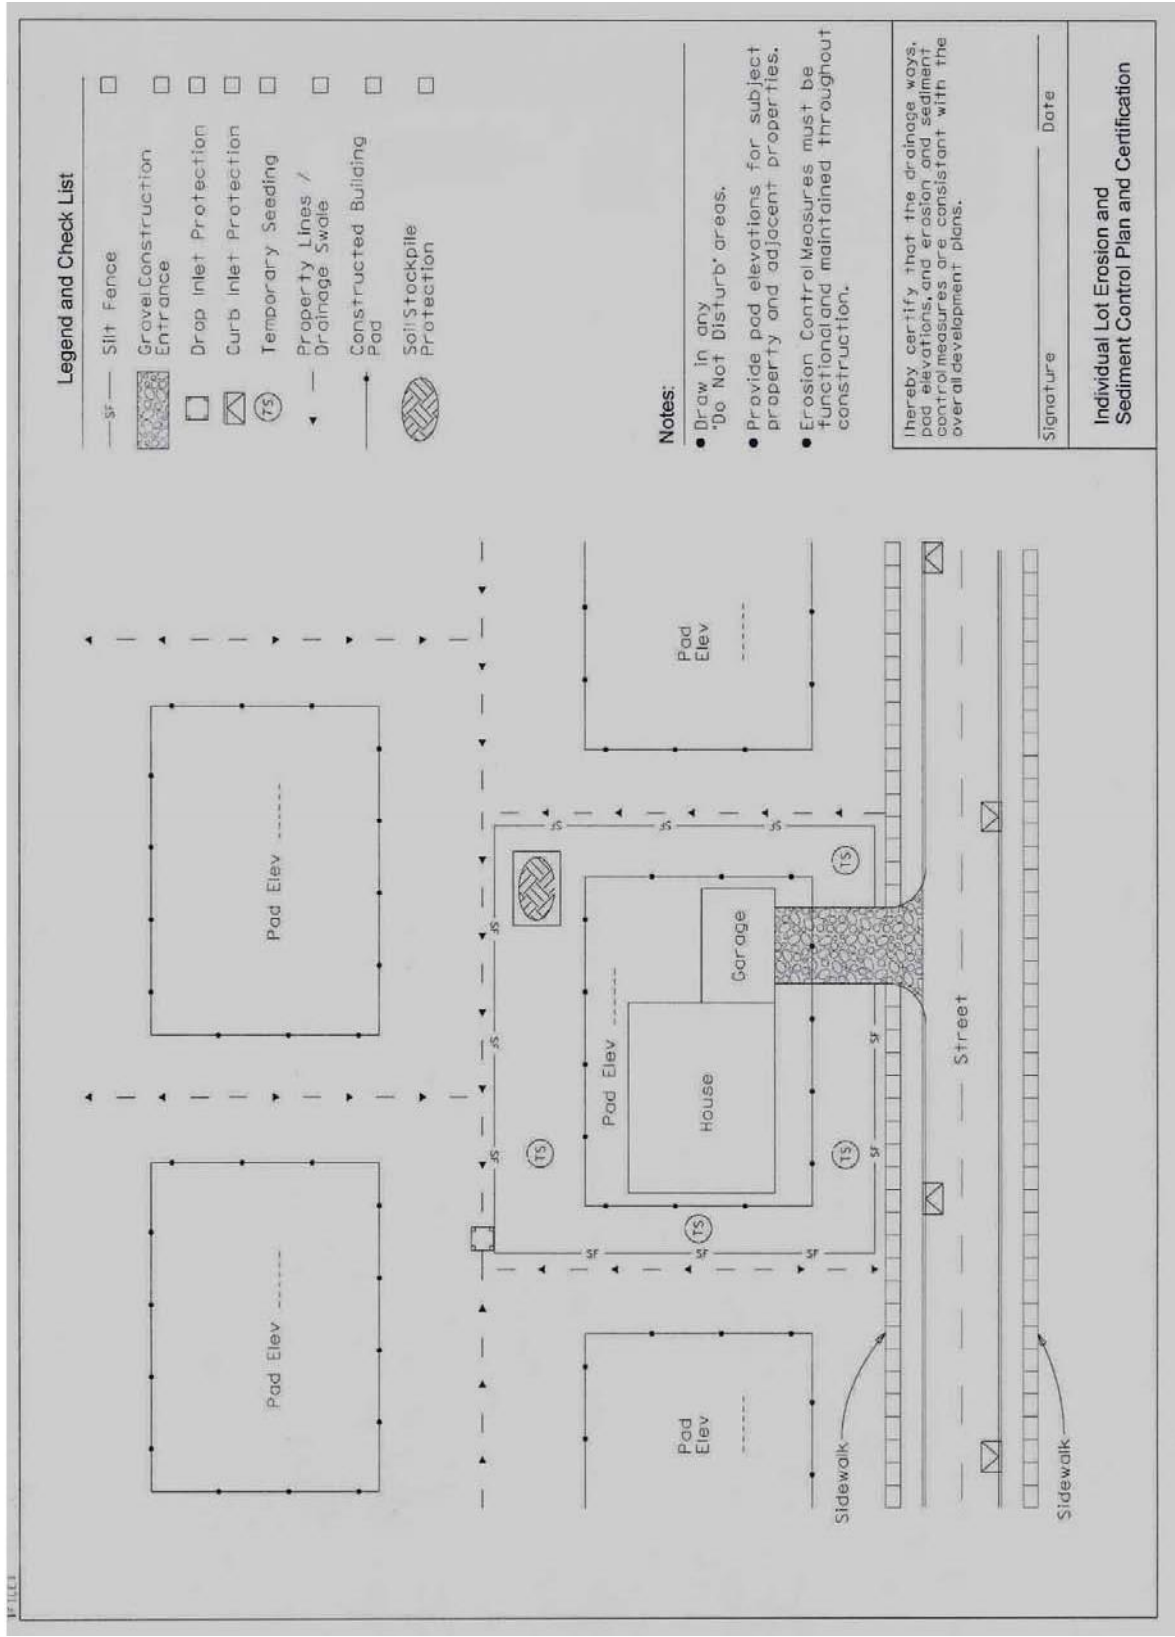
Individual Lot Typical Erosion & Sediment Control Plan and Certification
